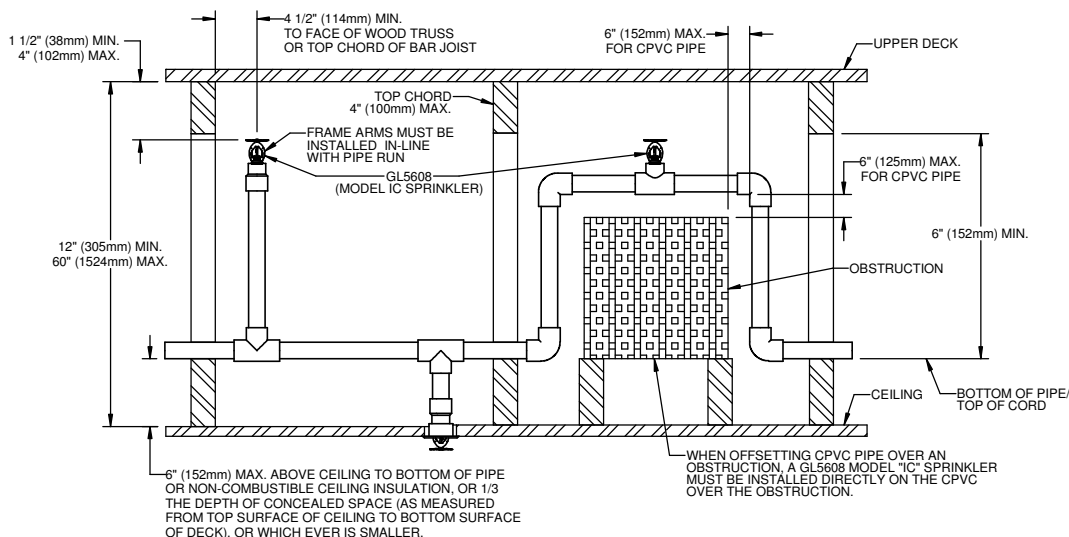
CPVC PIPE UNOBSTRUCTED WOOD TRUSS AND BAR JOIST CONSTRUCTION
